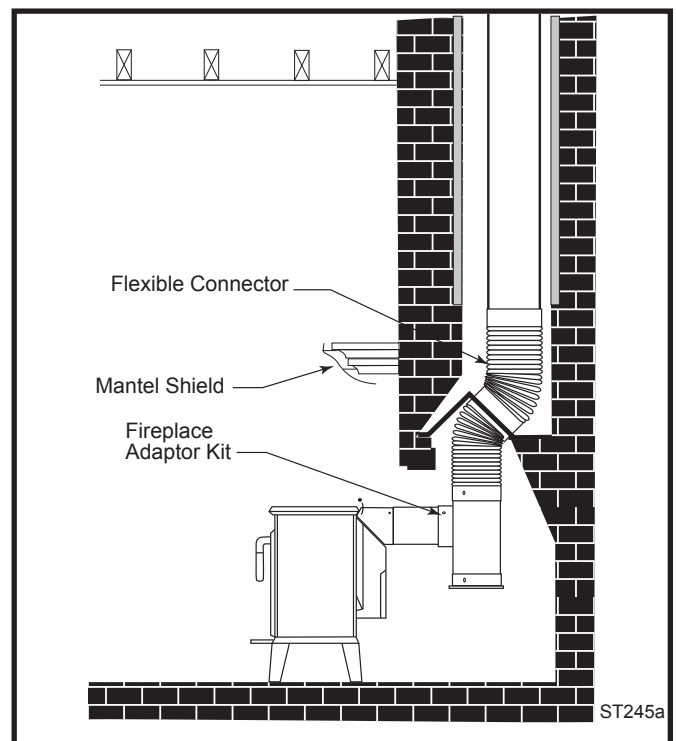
Chimney connector enters chimney through the fireplace opening.
